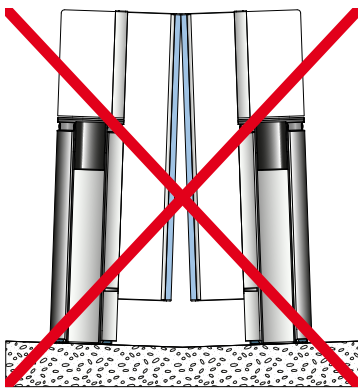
Do not exceed the flatness tolerance.
